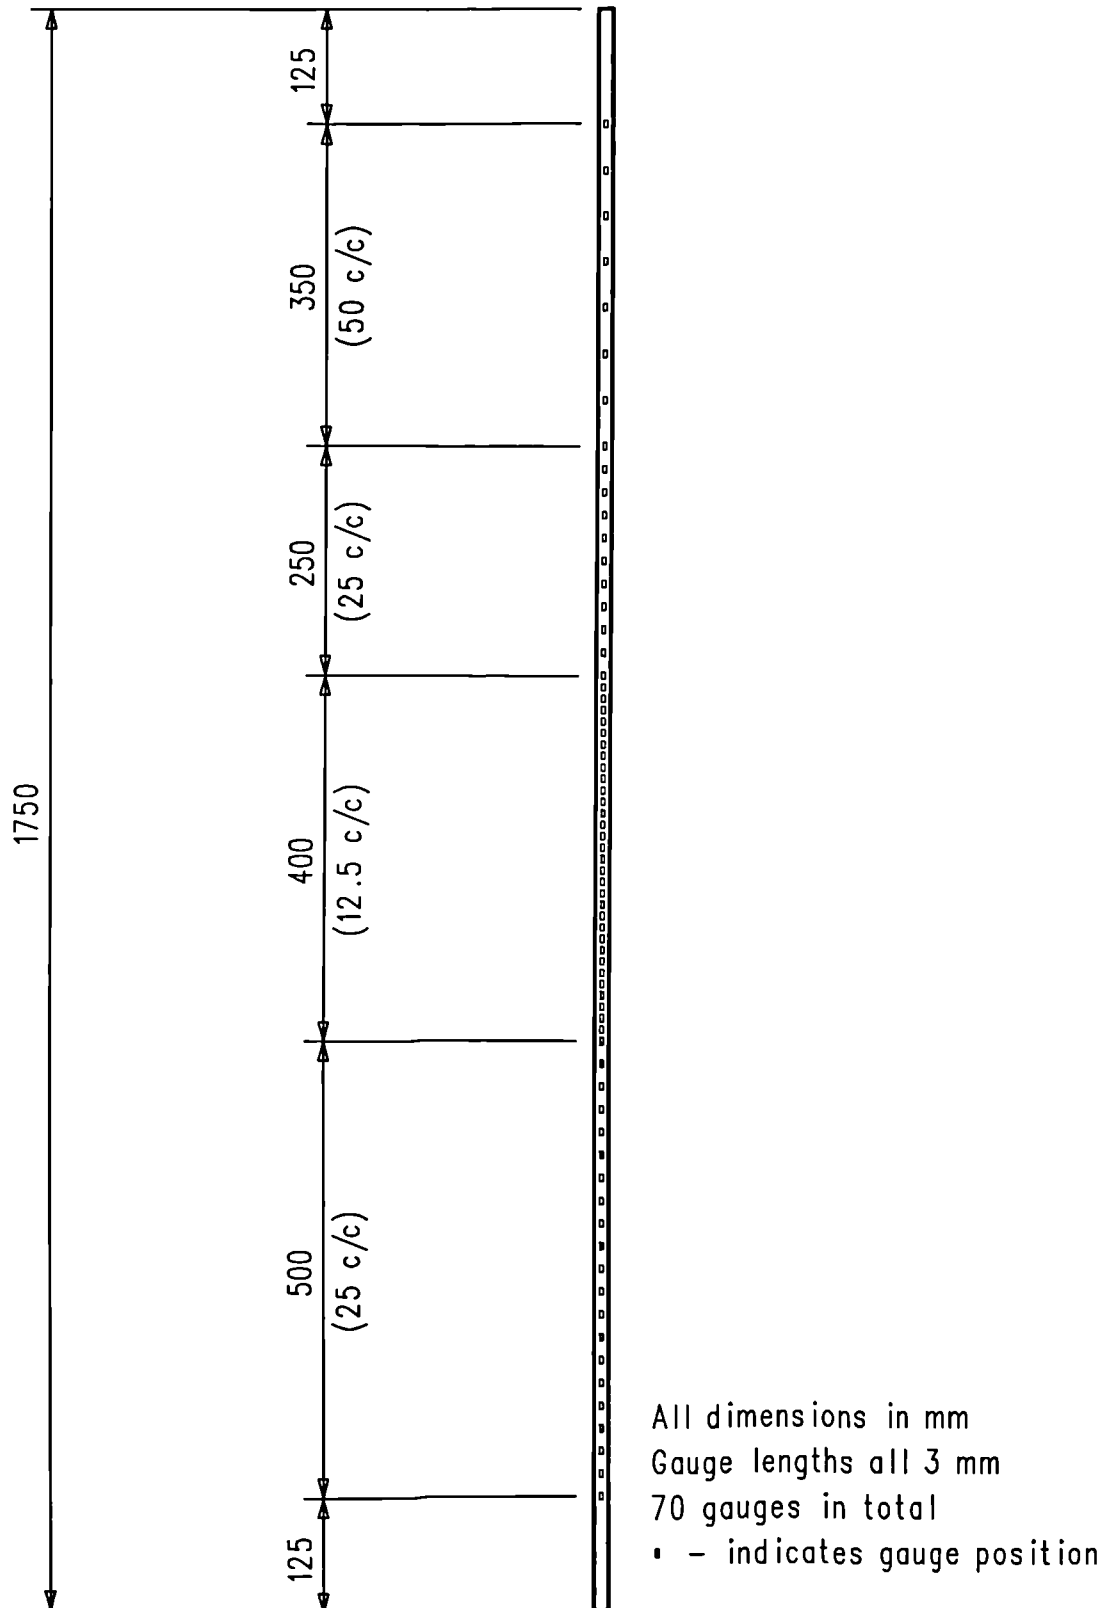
Column rebar - strain gauge layout B
